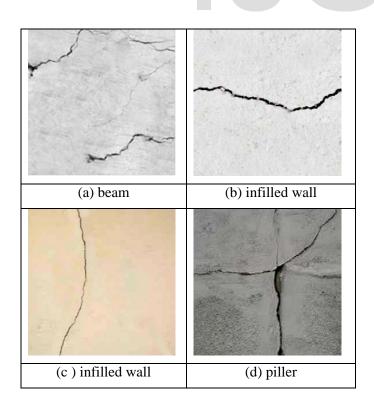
Captured cracks from (a) beam of hero honda show room sallaghari (b) infilled wall of Khwopa Engineering College, bhaktapur (c) infilled wall of Shanti Niketan School, chundevi (d) piller of Residential building of Chabahil:
